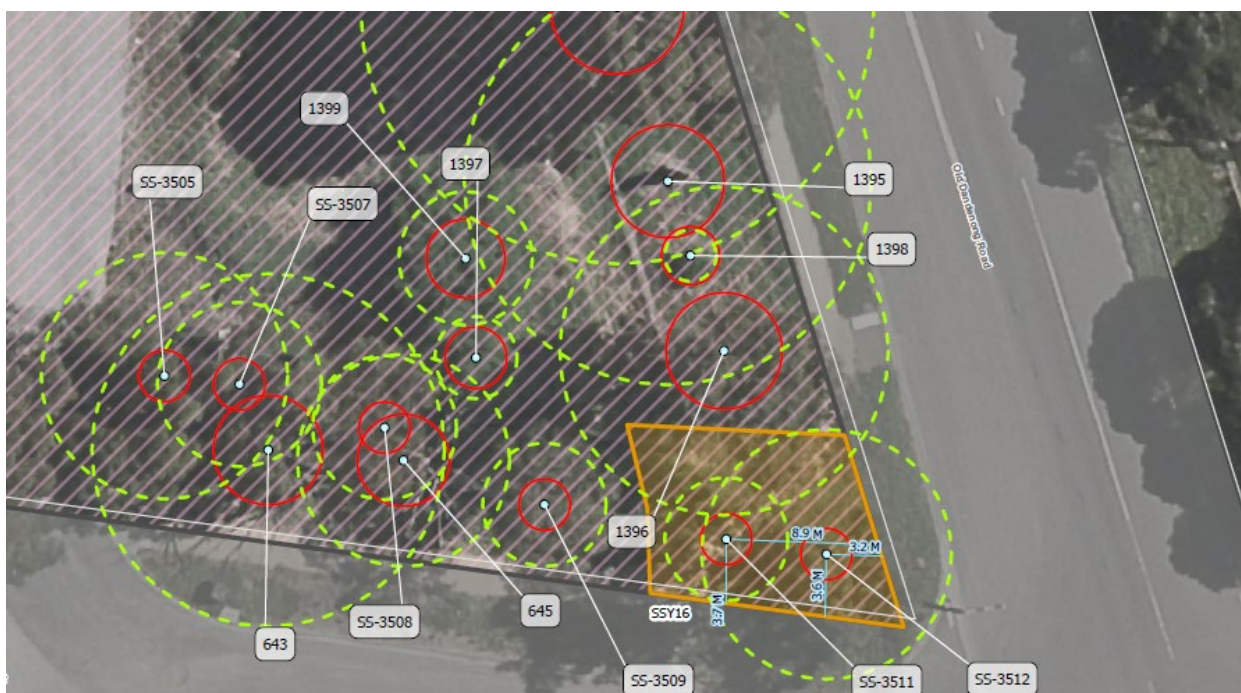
Aerial plan identifying trees to be removed in southeast corner
